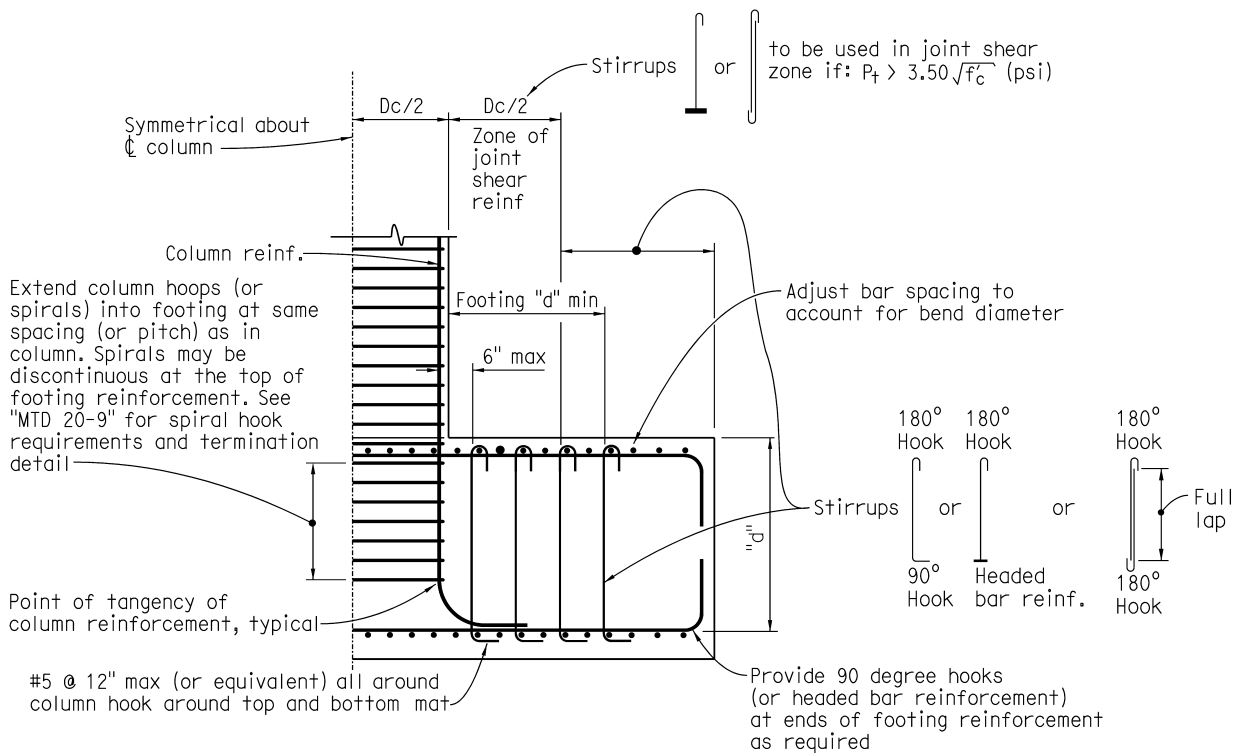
Footing Reinforcement – Fixed Column
